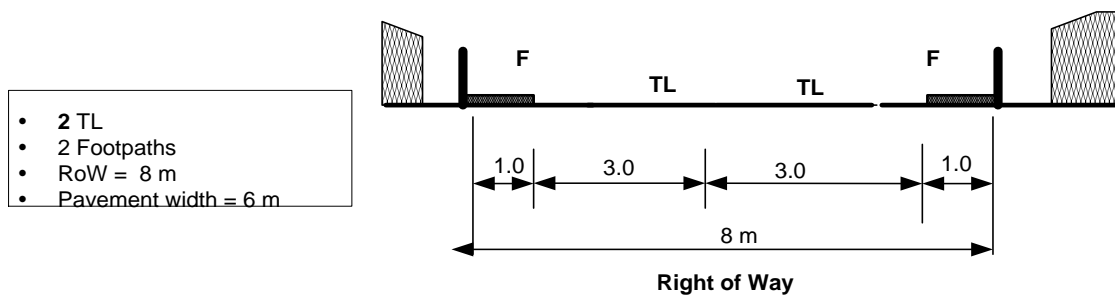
, Typical Cross section of Class C Roads (RoW 8 m)
